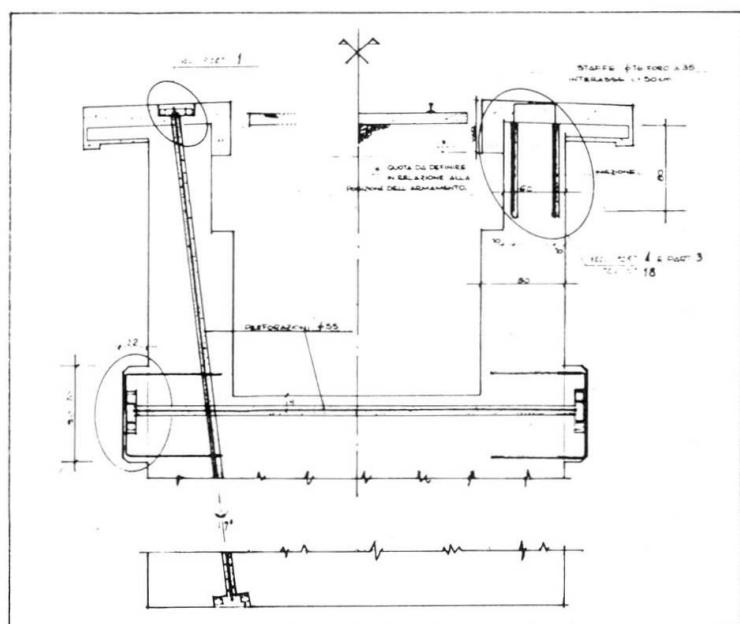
The interventions based upon the insertion of prestressed Dywidag bars.
